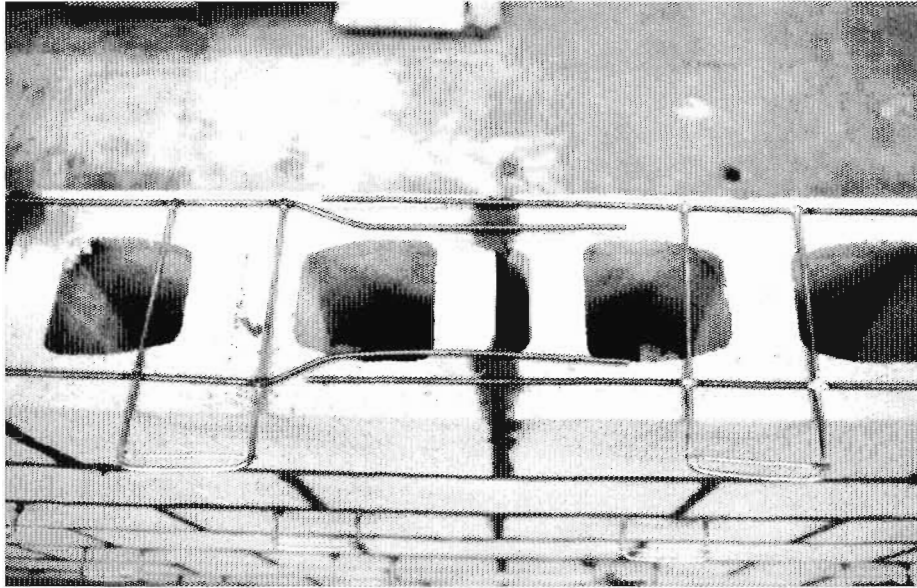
LAP SPLICING OF CONTINUOUS REINFORCEMENT USED IN WALL5
